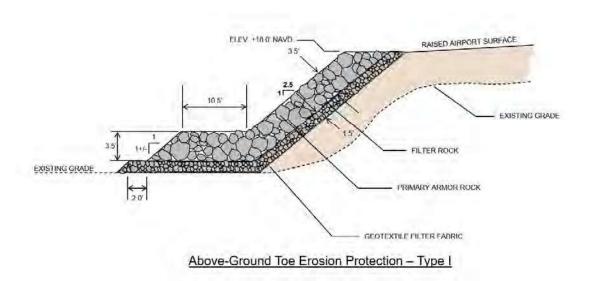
Example of an Above-Ground Toe Erosion Typical Section (Type I 2.5H:1V Concept Shown)
